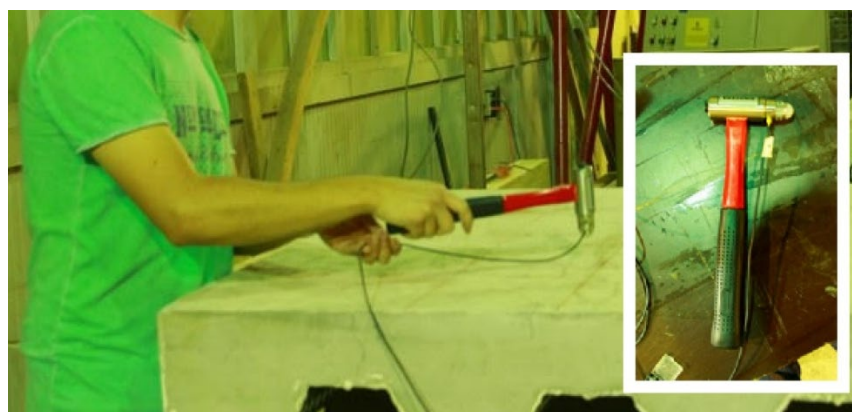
Concrete damage inspection by impact hammer [81]
